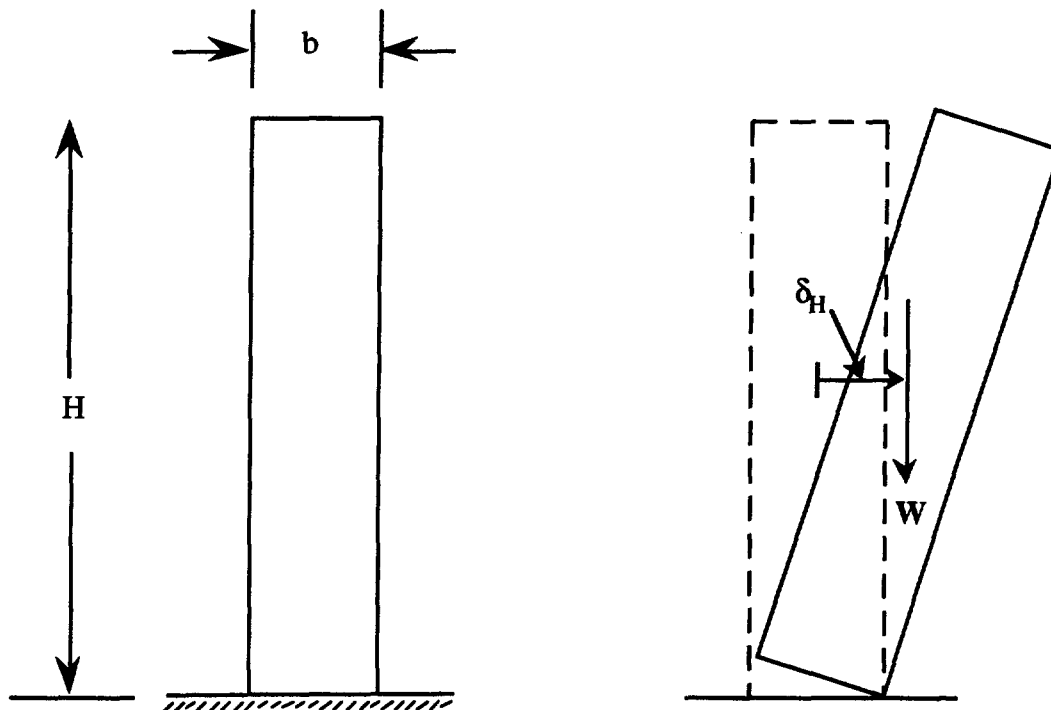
Methods for Evaluation of Out-of-Plane Bending of Non-Bearing Infill or Partition Unreinforced Masonry Walls in Section 10.5.1
